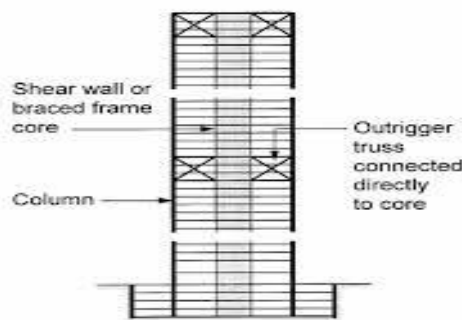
Conventional Outrigger beam/truss Connected directly to Core
